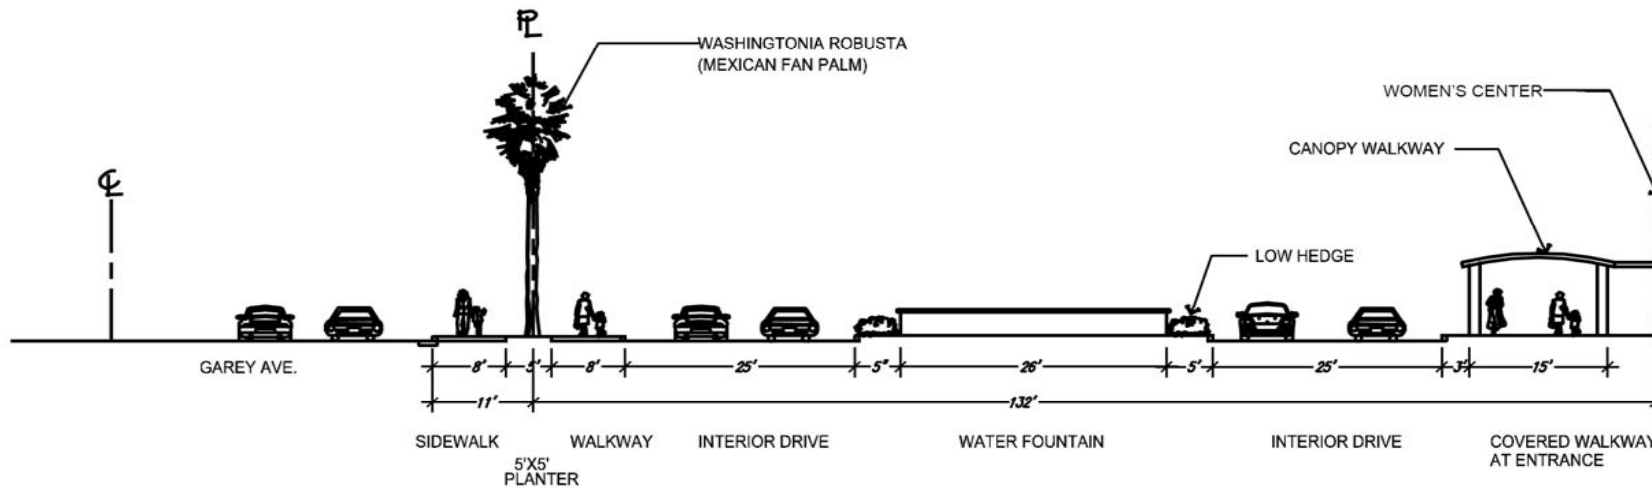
Sections E1 & E2—Garey Avenue
